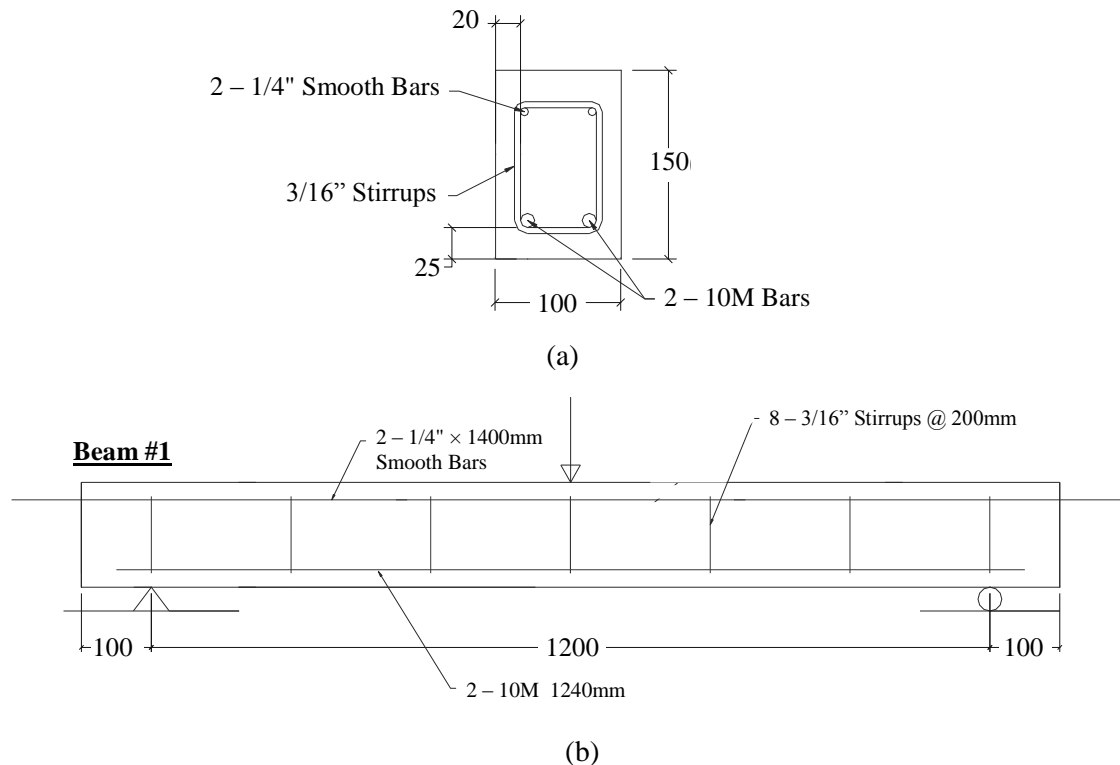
Typical test specimen (a) Cross section and (b) Elevation.
